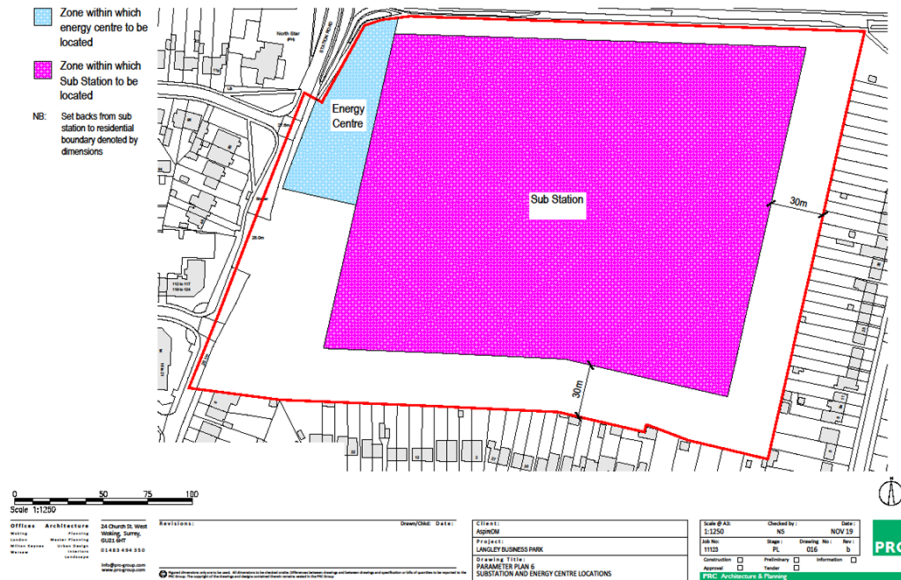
Parameter Plan 6- Sub Station and Energy Centre Locations
